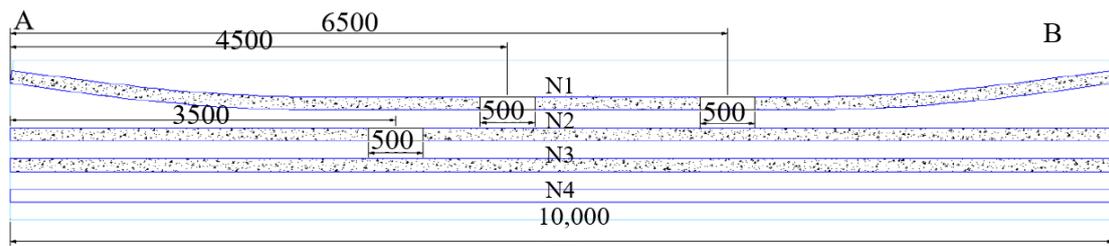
Model design drawing of pre-stressed beam (unit: mm).
